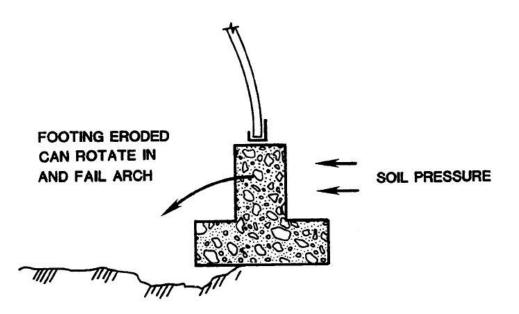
(Exhibit 77) Footing Rotation due to Undermining
